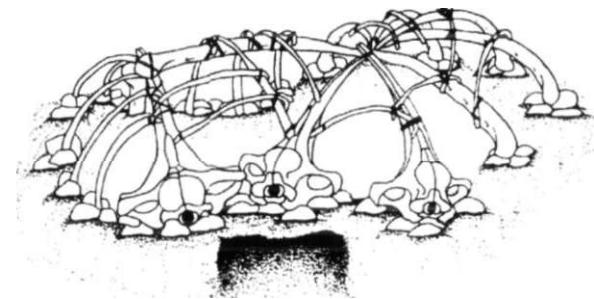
The structure of a whalebone house is constructed using the skeleton of a Baleen Whale
